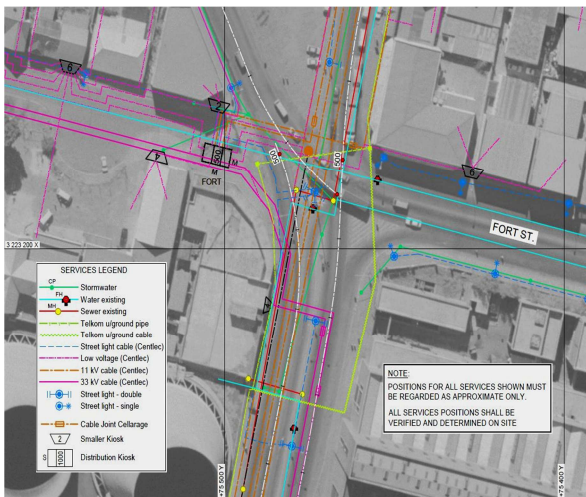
Layout of services at the intersection of Harvey Road, Hanger Street and Fort Street.
